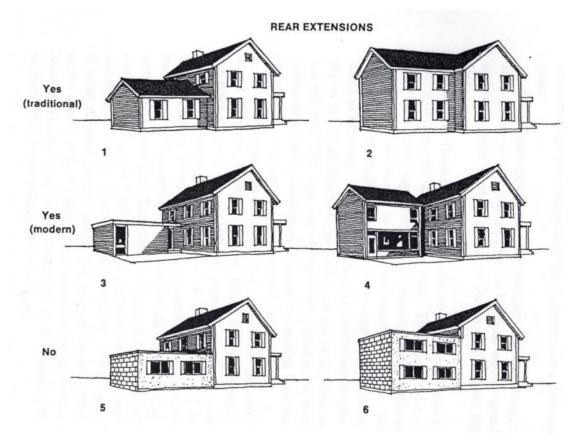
General guidance for adding "rear extensions" to a heritage building (from Stephen 1972:108). As currently proposed, the design follows illustration "2" under "traditional" The new elements were therefore designed to:
